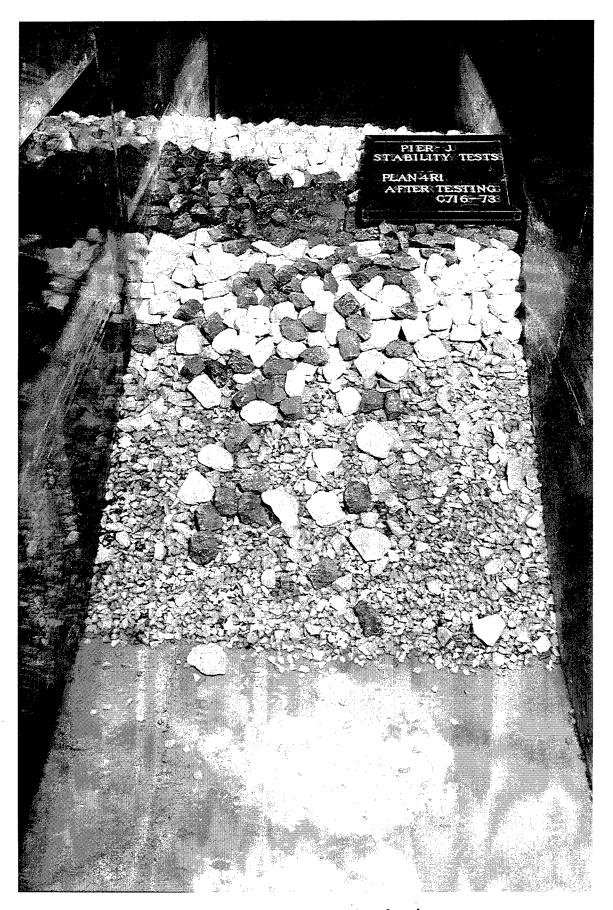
Harbor-side view of Plan 4R1 at the conclusion of testing
